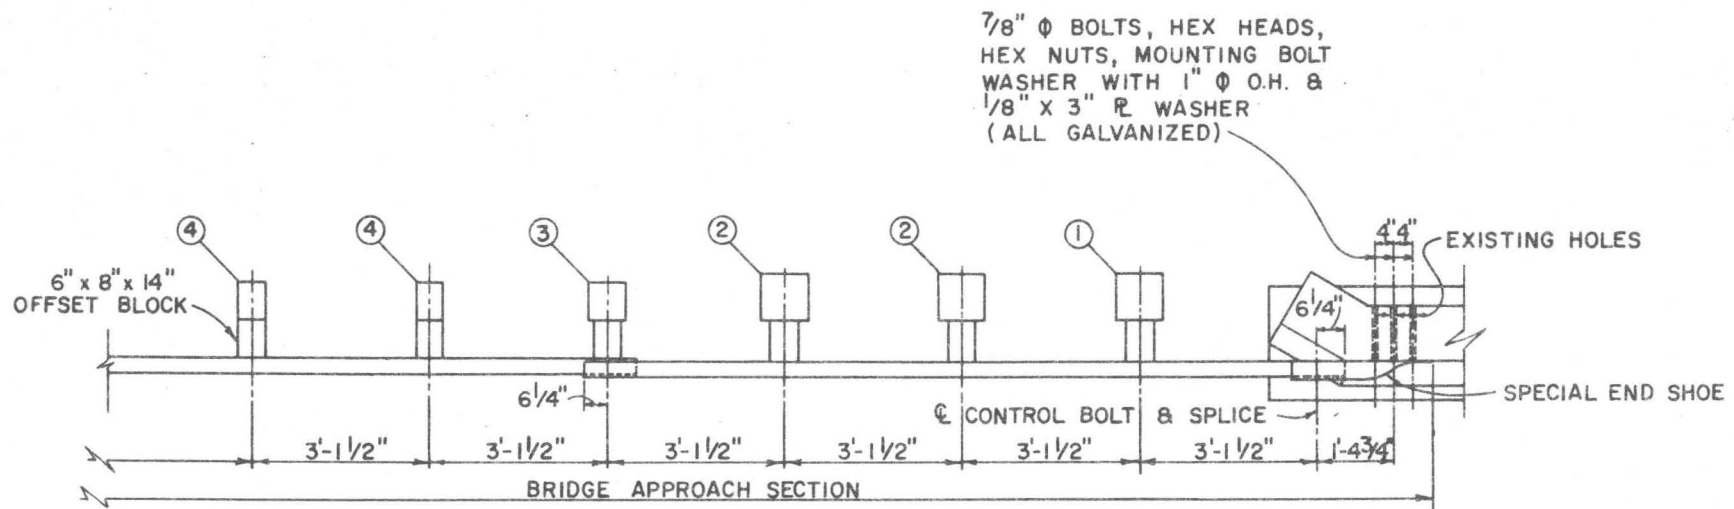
DETAILS OF EXISTING DOUBLE BEAM APPROACH GUARDRAIL
